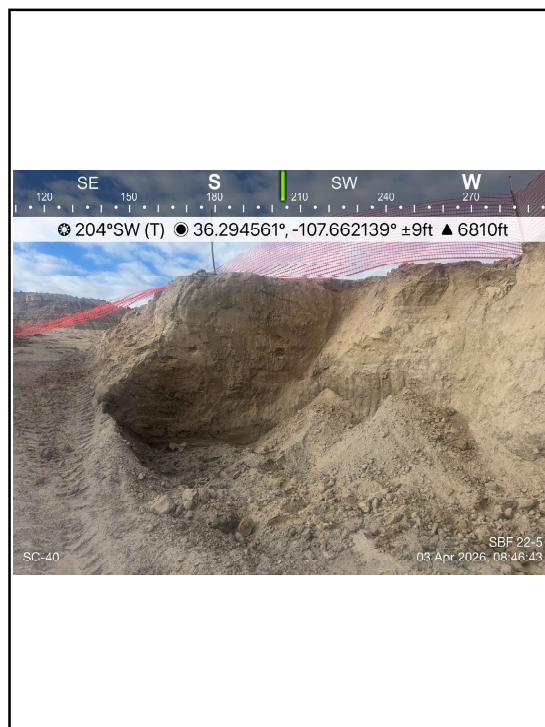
Looking south-southwest at final southwest and southeast walls of the excavation.
